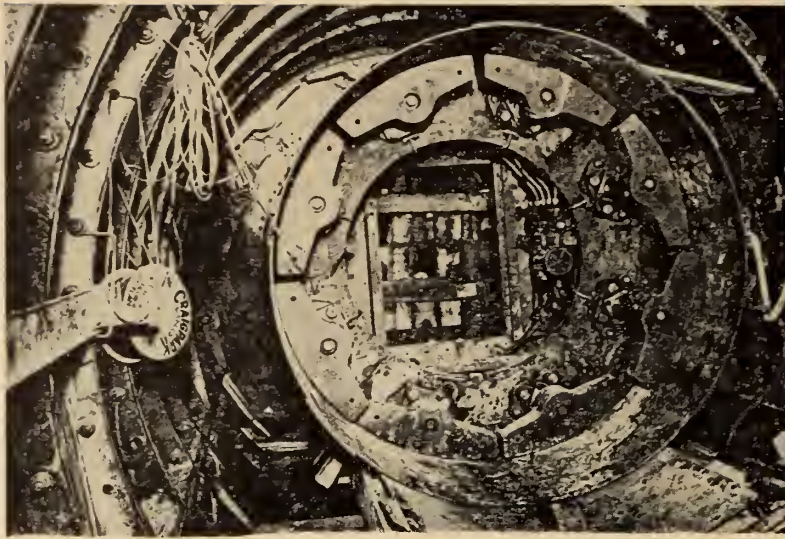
London underground railway tunnel shield ready for travelling forward.
